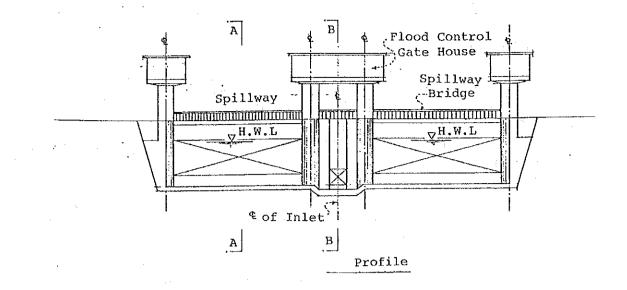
Flood Control Plan for Low Rise Case
